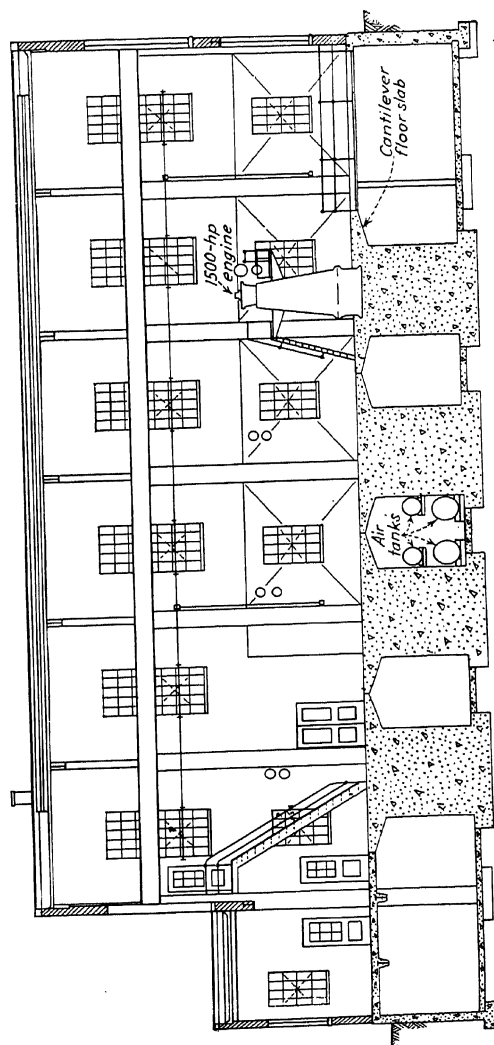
Floor slabs built as cantilevers from engine foundations. (Courtesy of Burns & McDonnell Engineering Company.)
